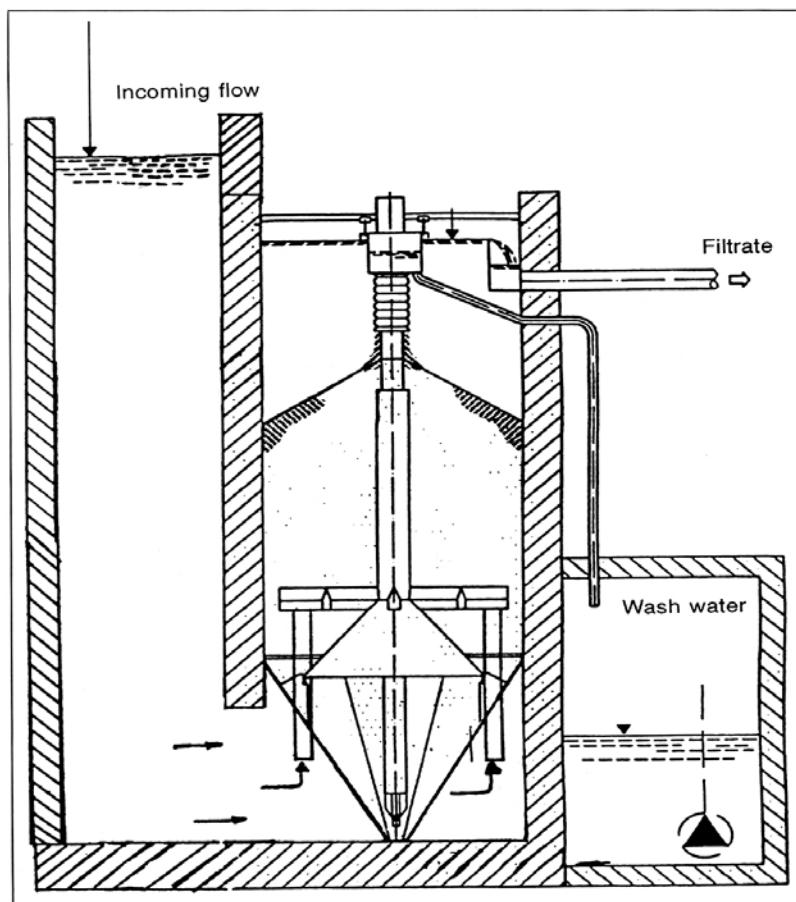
Bottom Feed Concrete Filter¹⁶
